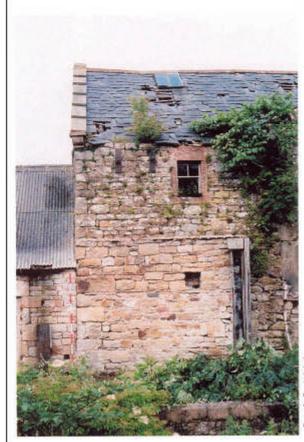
Phase 2 extension at right angles to the original building. The scale measures two metres. (photograph: P. Cracknell)
